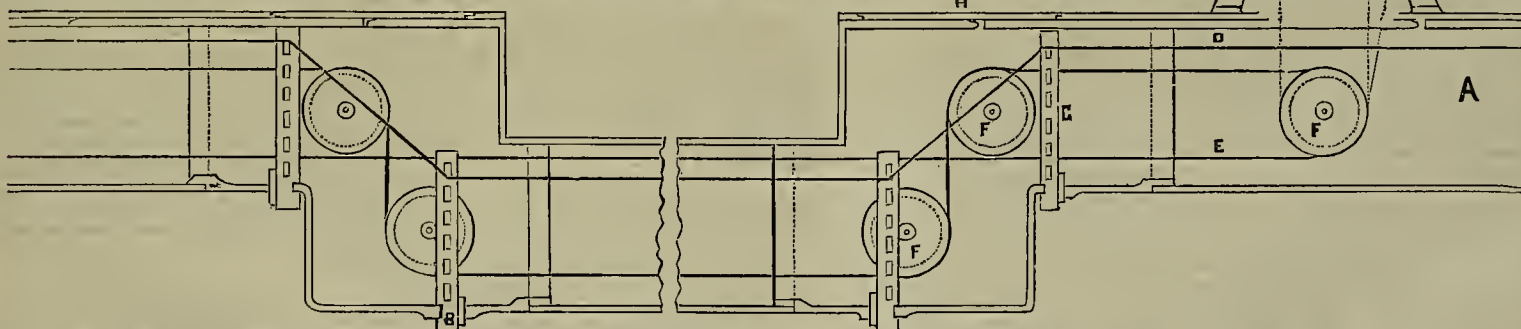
LONGITUDINAL SECTION OF TEGGART'S UNDERGROUND CONDUIT FOR ELECTRIC WIRES.
